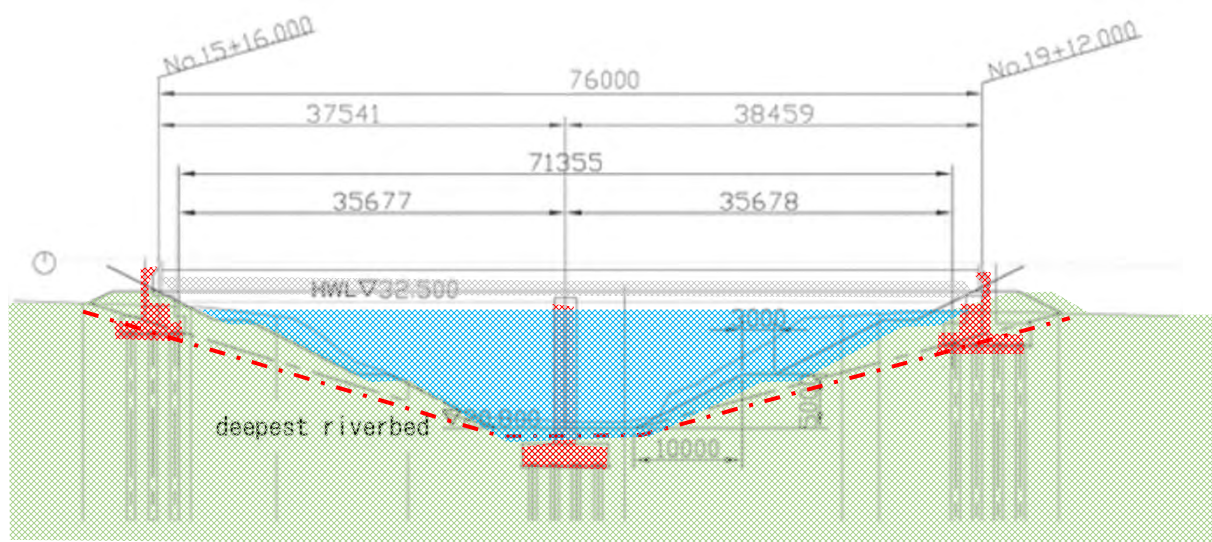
Explanatory Figure of Bridge Length and Span Arrangement for Aum Bridge
